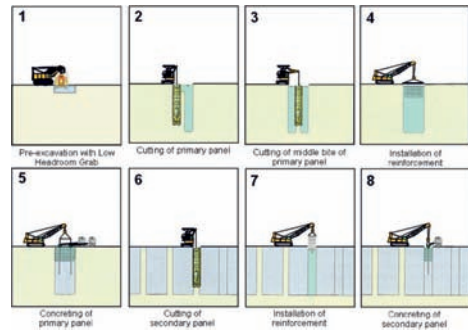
Diaphragm wall construction sequence (courtesy of Bauer/Piling Contractors).
